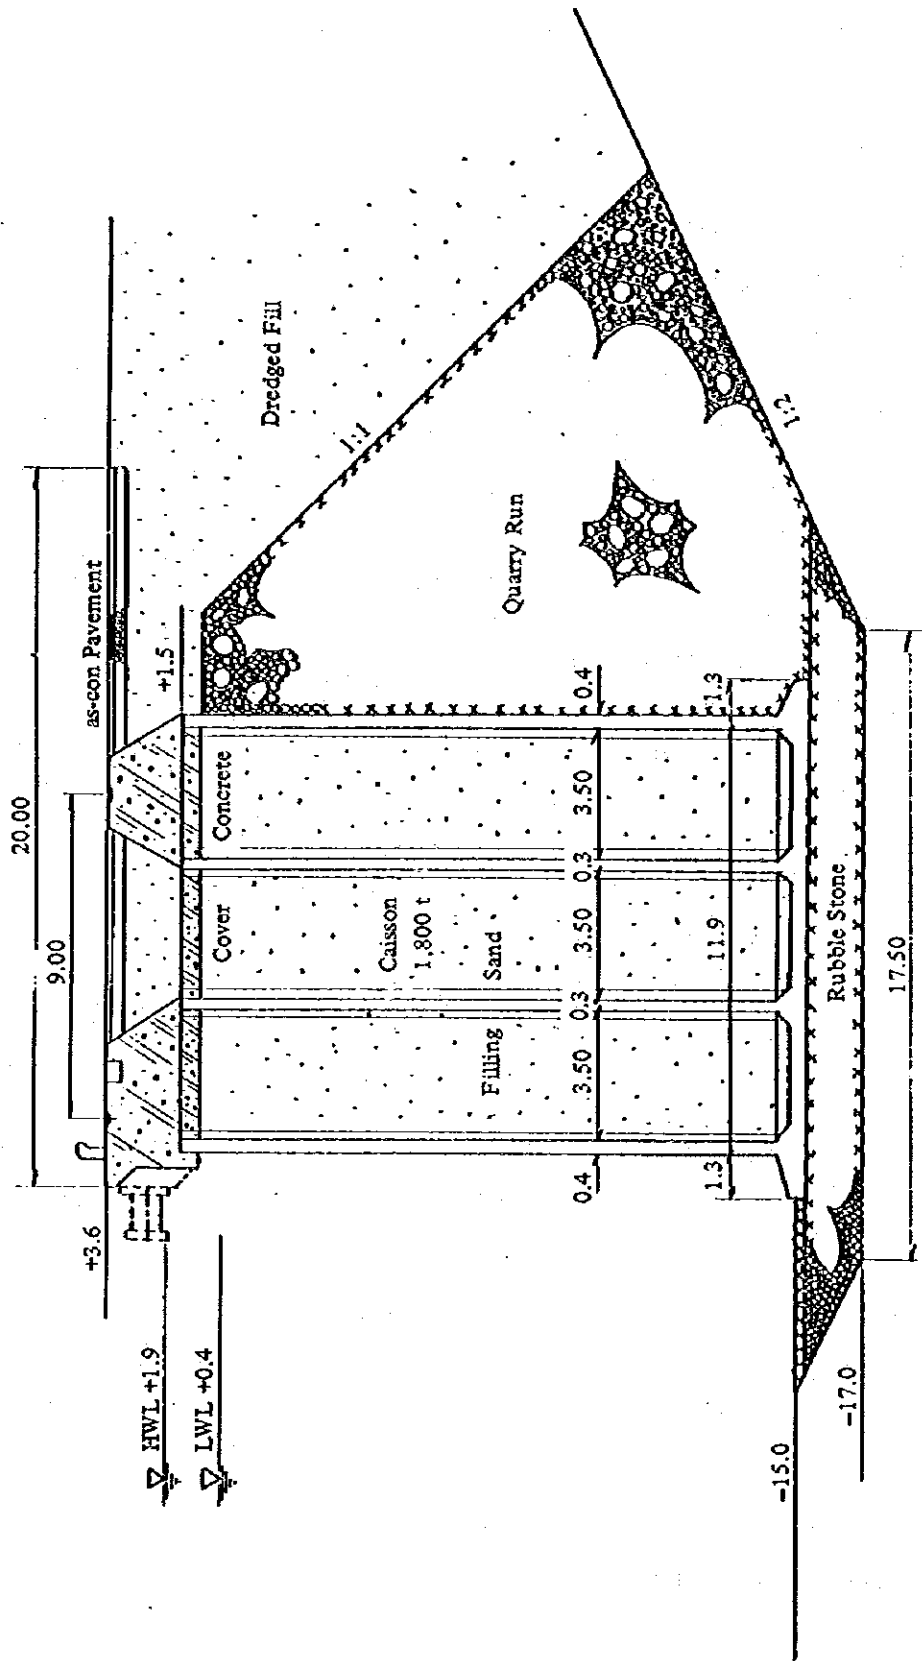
Section of Concrete Caisson for Grain Berth
